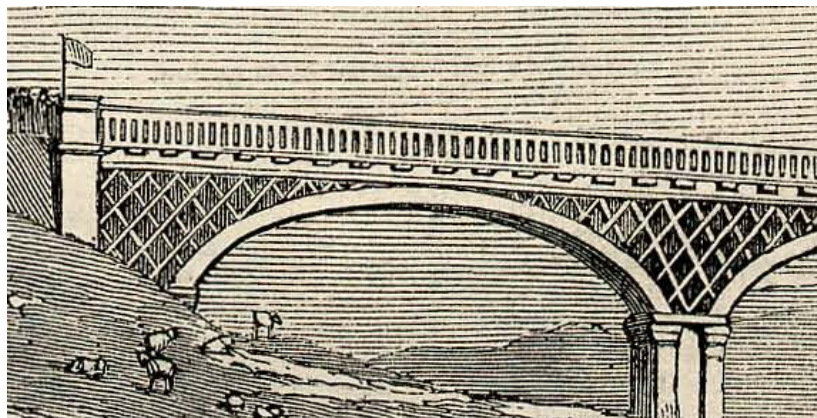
Bridge parapet circa 1851 (Illustrated London News, 1851)
